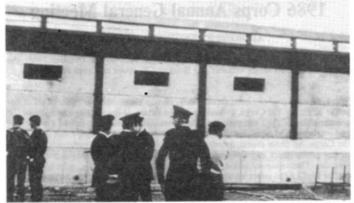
Projectile walls constructed by 20 Field Squadron. 150mm precast reinforced concrete on strip foundations.
